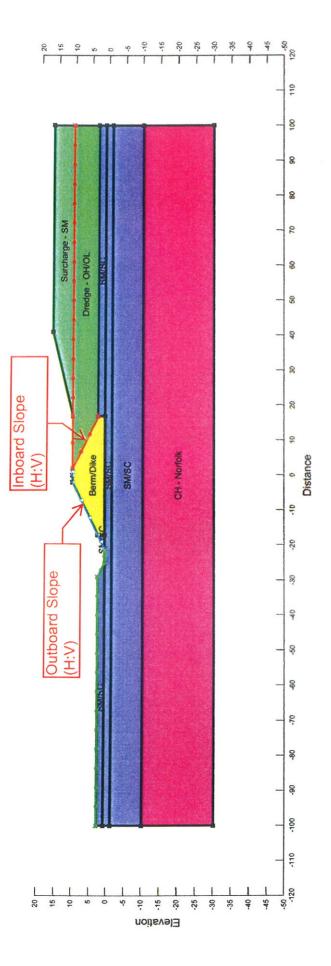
el10.0u - Section 2 Impounded phreatic surface at El 10.0 (undrained case - short term).
